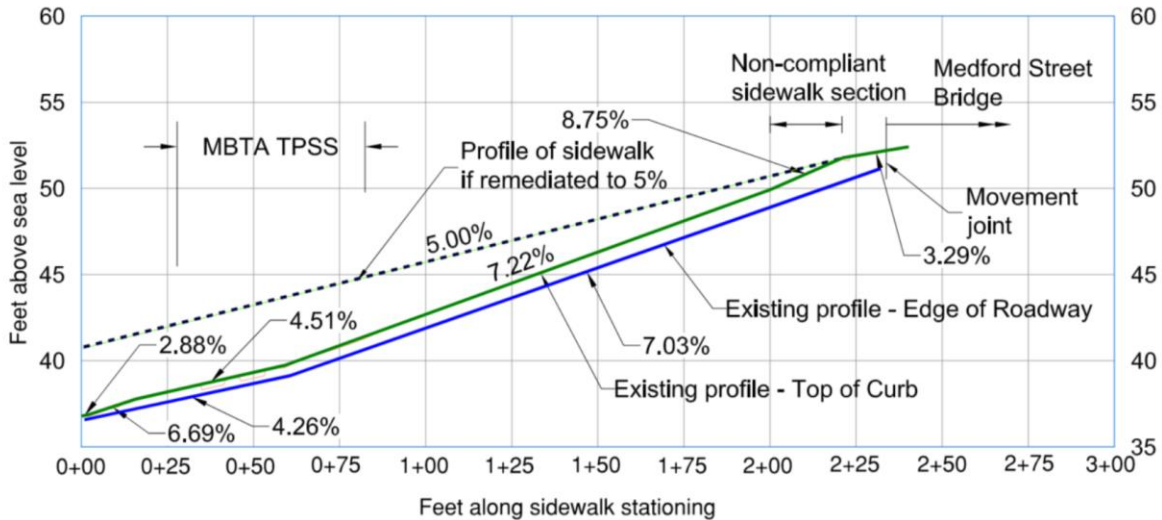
Profile along Medford Street, north of existing bridge movement joint
